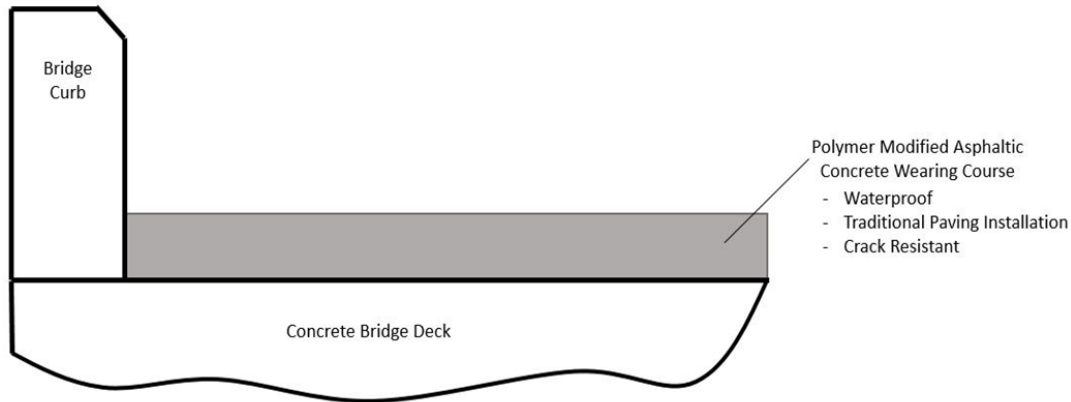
Bridge deck waterproofing surface course - New Jersey DOT
